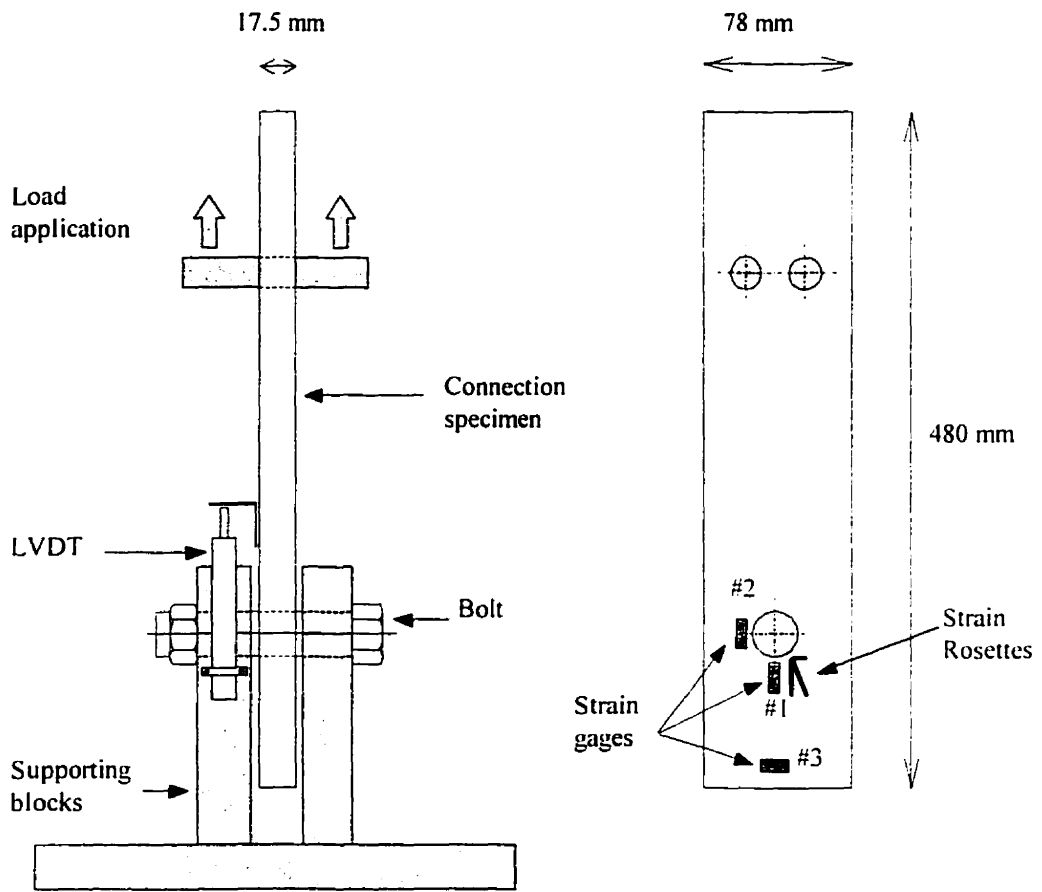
8 Location of Strain Gages on a One-Bolt Connection Specimen
